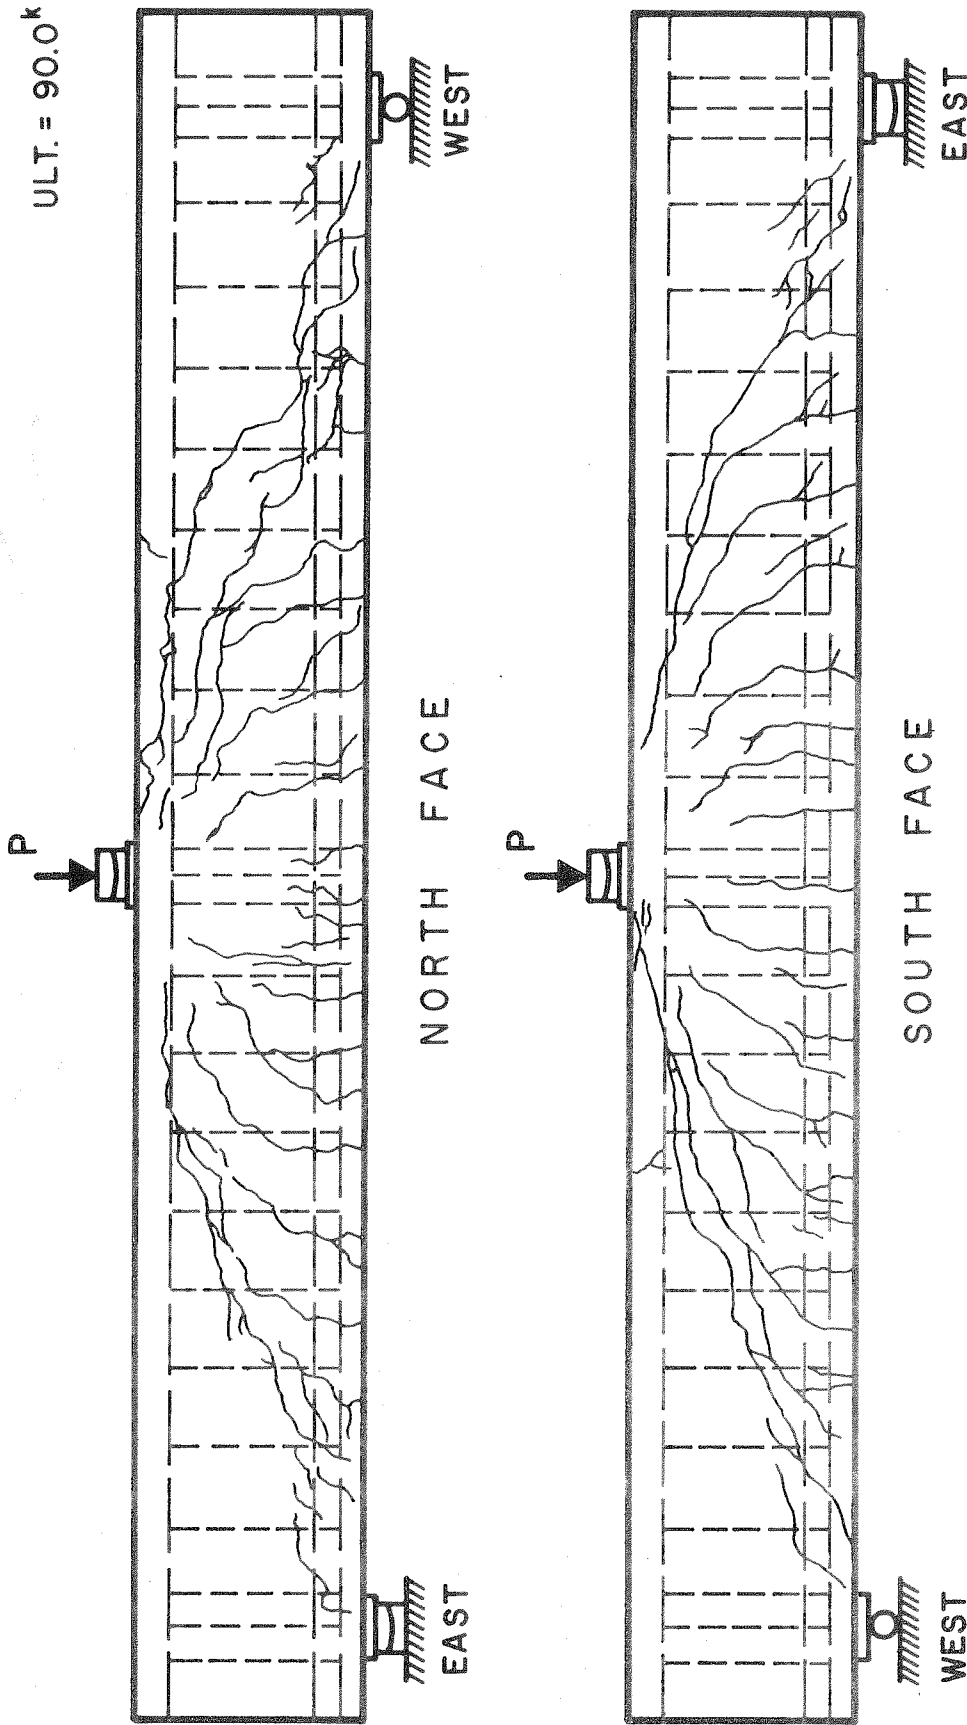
CRACK PATTERN OF BEAM XB-1
